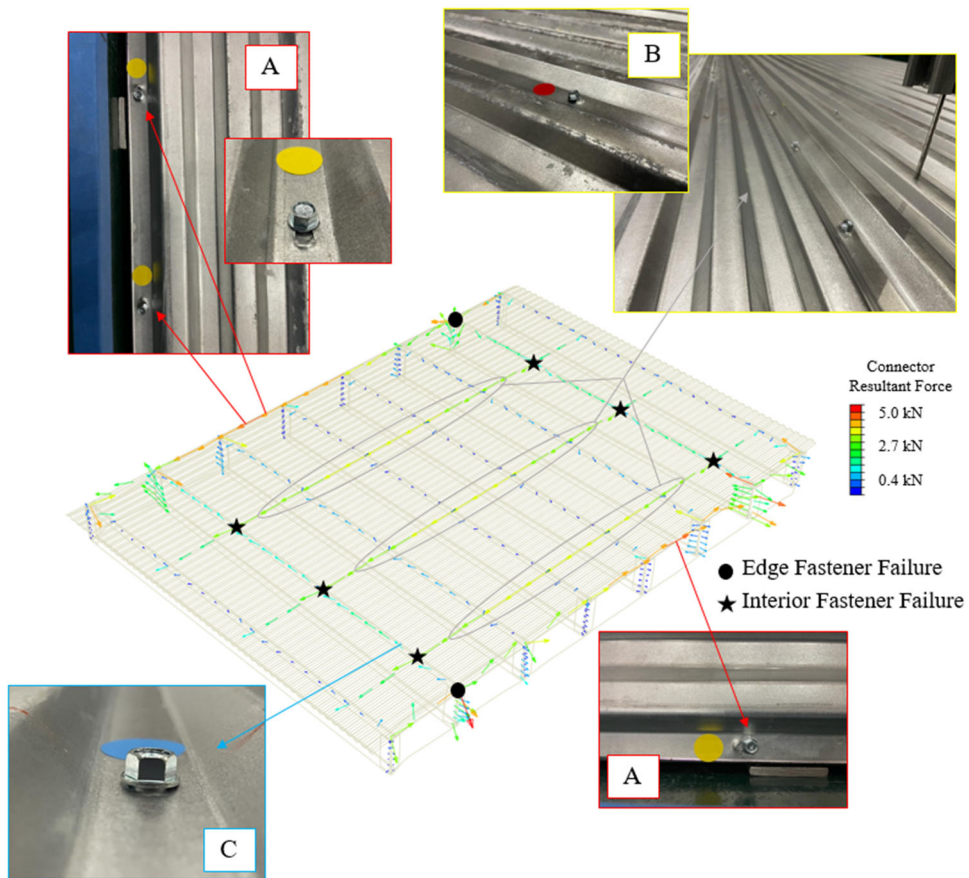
Failure: (A) Edge Connections, Bearing, Flush Head – (B) Side-lap Connections, Screw Tilting, No Flush Head – (C) Support Connections, Incipient Tilting/Bearing, Tilted Head
